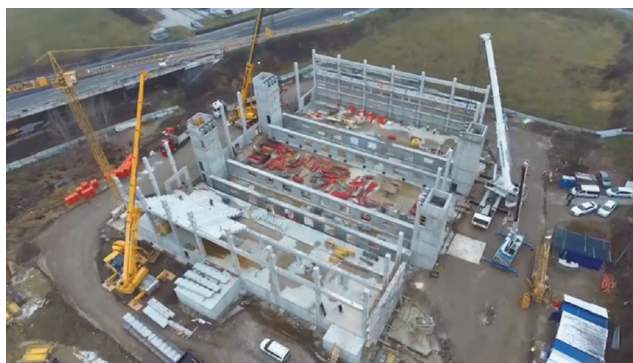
Zeleni Brijeg Hall in Sisak during construction
